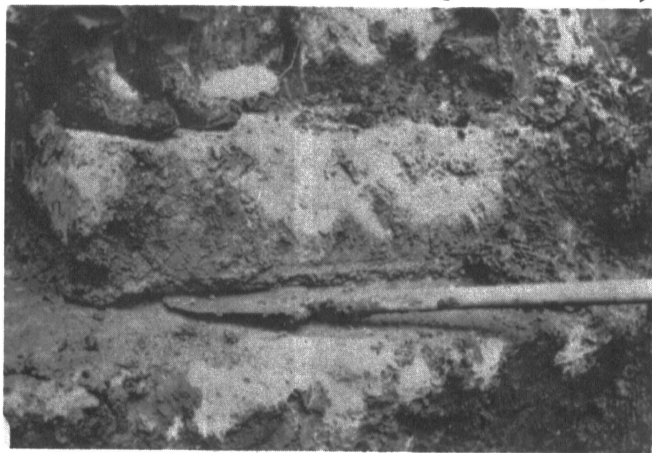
Open space between reinforced concrete and plain concrete foundation, due to uneven settlements
